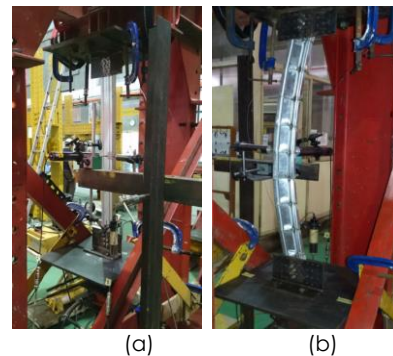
Schematic diagram of compression column testing for a) normal section and b) curved section
